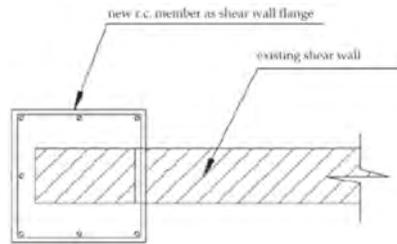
Detail of strengthening solution for structural walls, with RC jacketing interventions on the edges (adapted after [34]).
